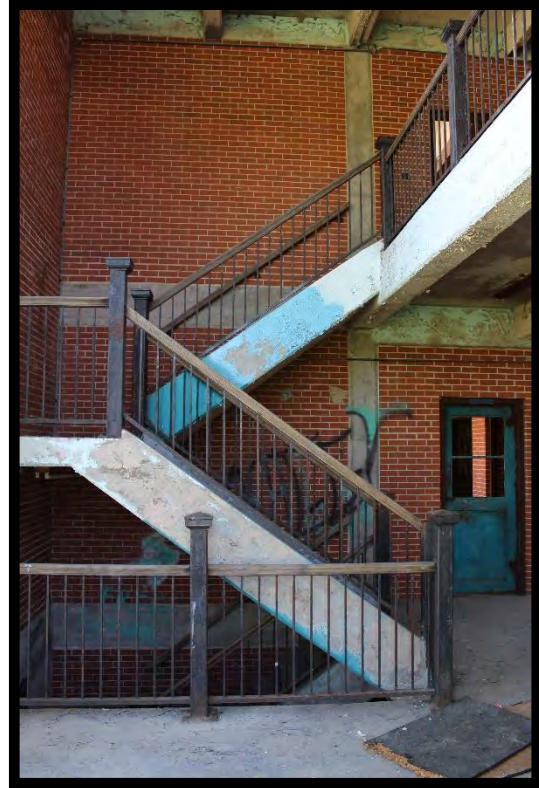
Lumberton Water Treatment Plant, Interior, Staircase and Balcony.
